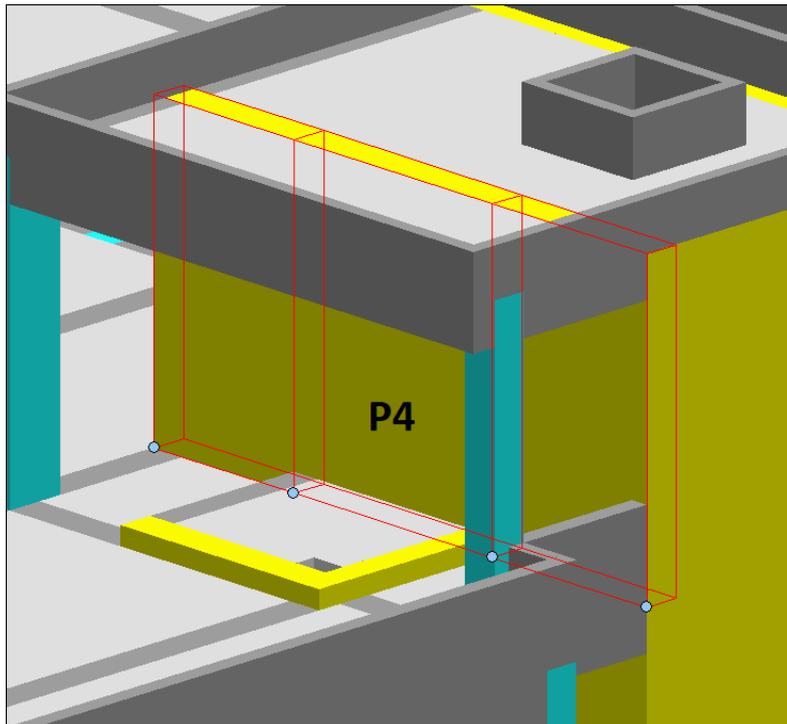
Incorrect Level of Structural Wall in Allplan Model
